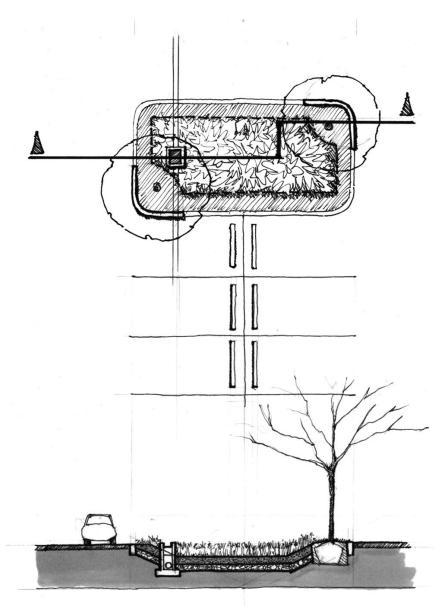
PARKING ISLAND POROUS LANDSCAPE DETENTION
